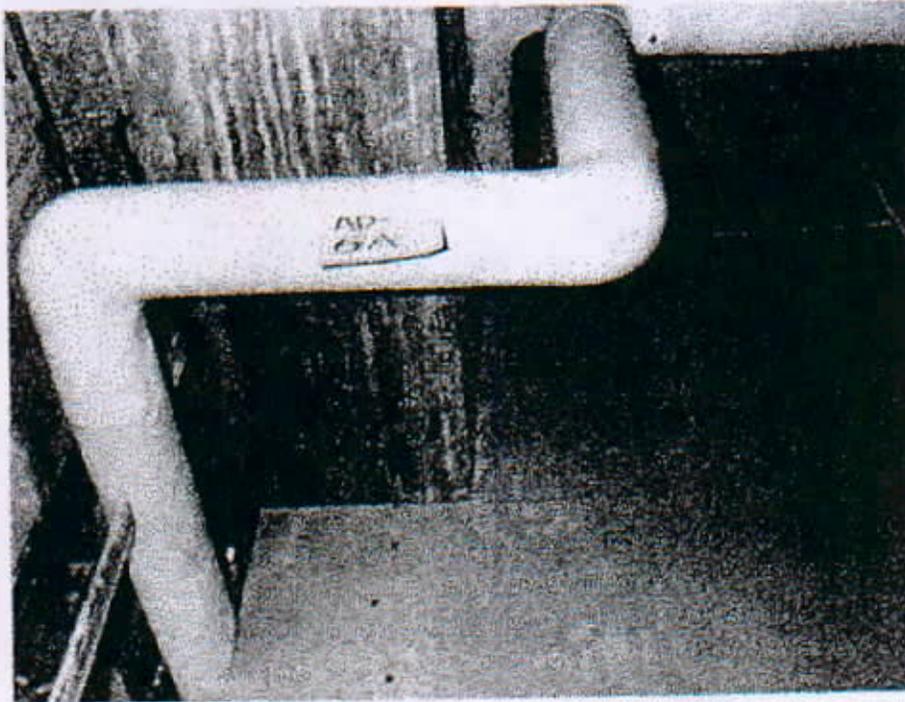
3-inch and 5-inch diameter pipe insulation.
